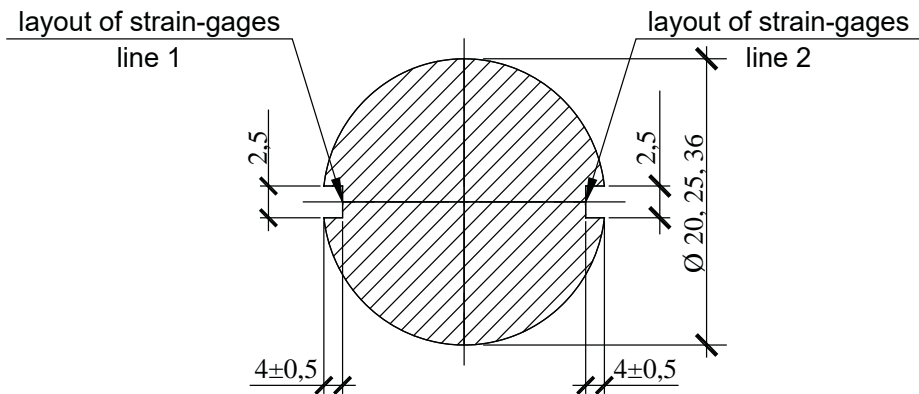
Layout of strain-gages on the reinforcement bar
